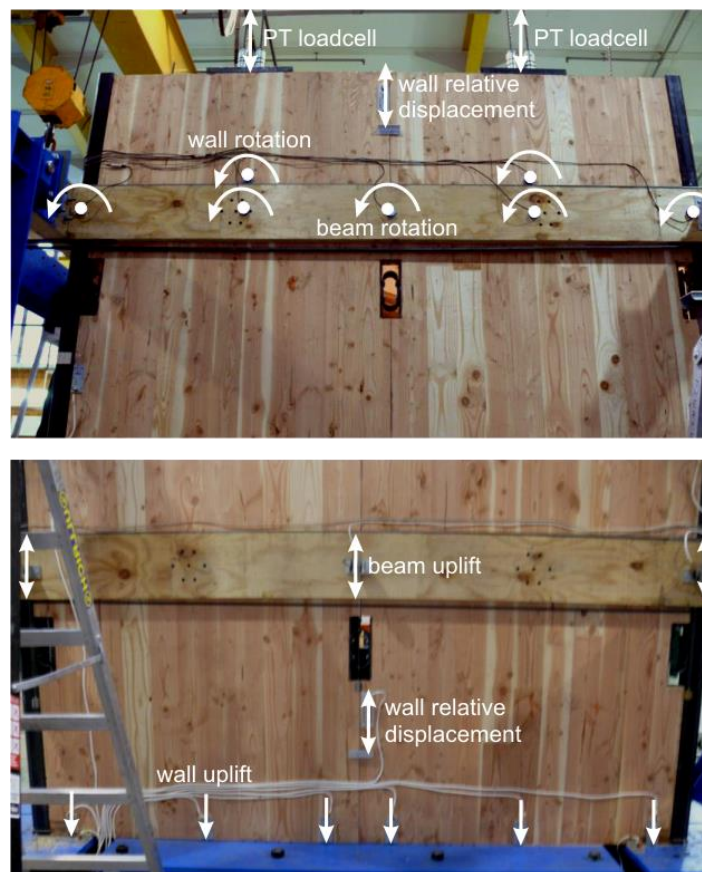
Upper and lower beam and wall and instrumentation (North walls)
